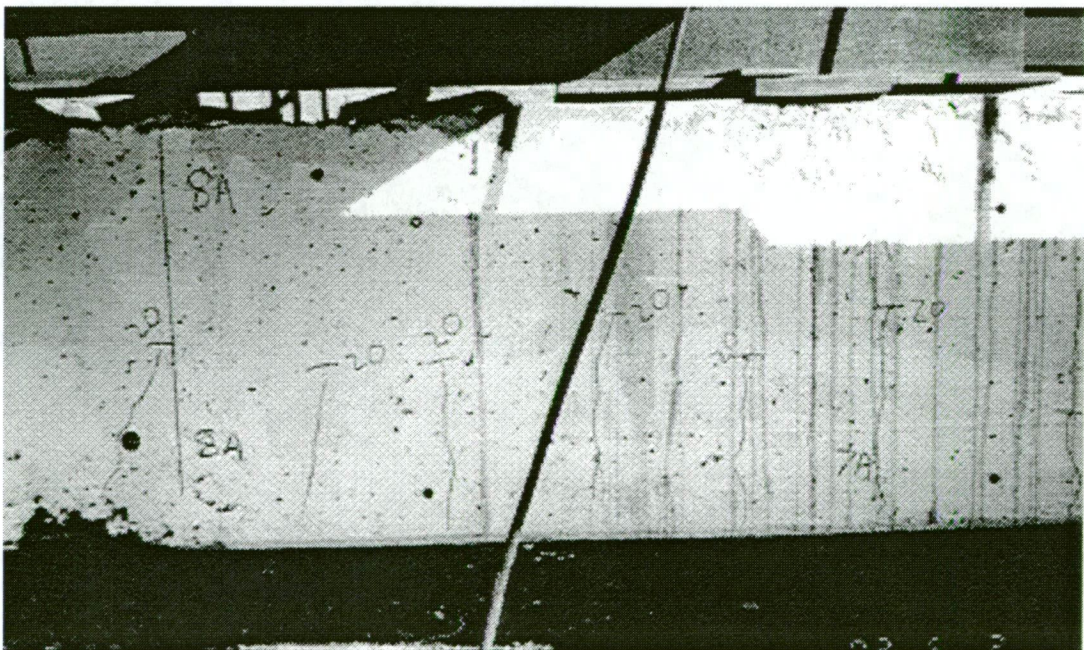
Flexural Beam Crack Patterns
